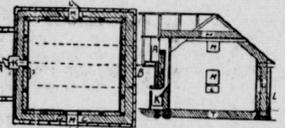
GROUND PLAN AND SECTION OF ICEHOUSE.
